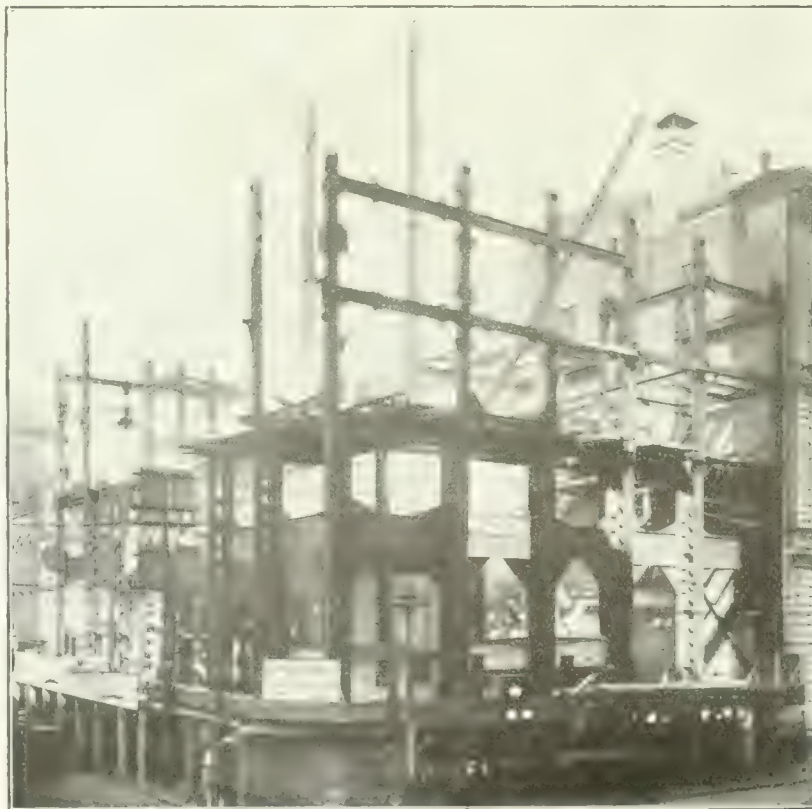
State of Erection of Royal Bank Building on March 20th, 1914.
